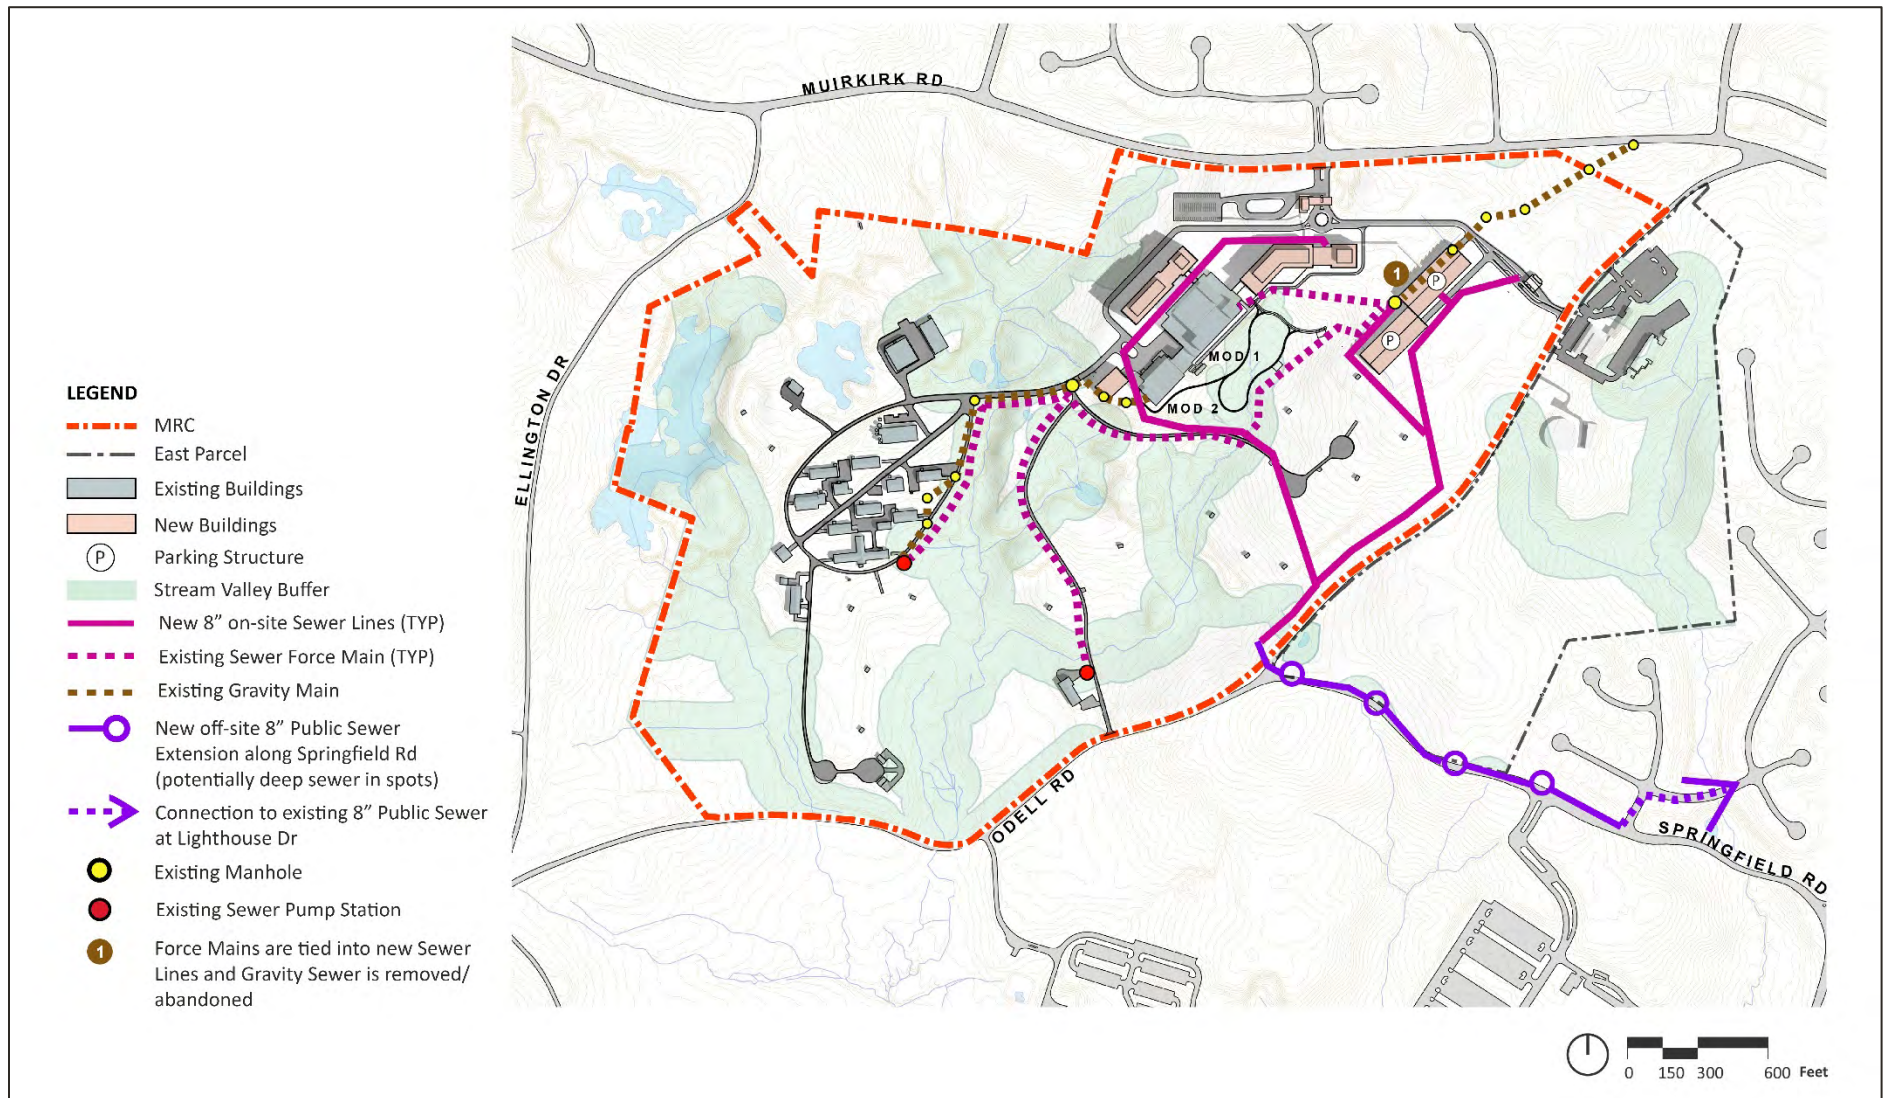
Proposed Sewer Service Plan for Alternative A
